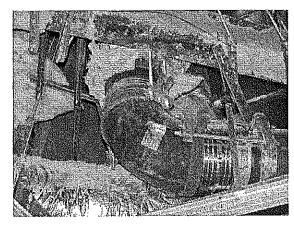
Post Failure Temporary Repairs at Point of Failure Illustrating New Code Compliant Joint Restraints and Couplings (Noted by Arrows
